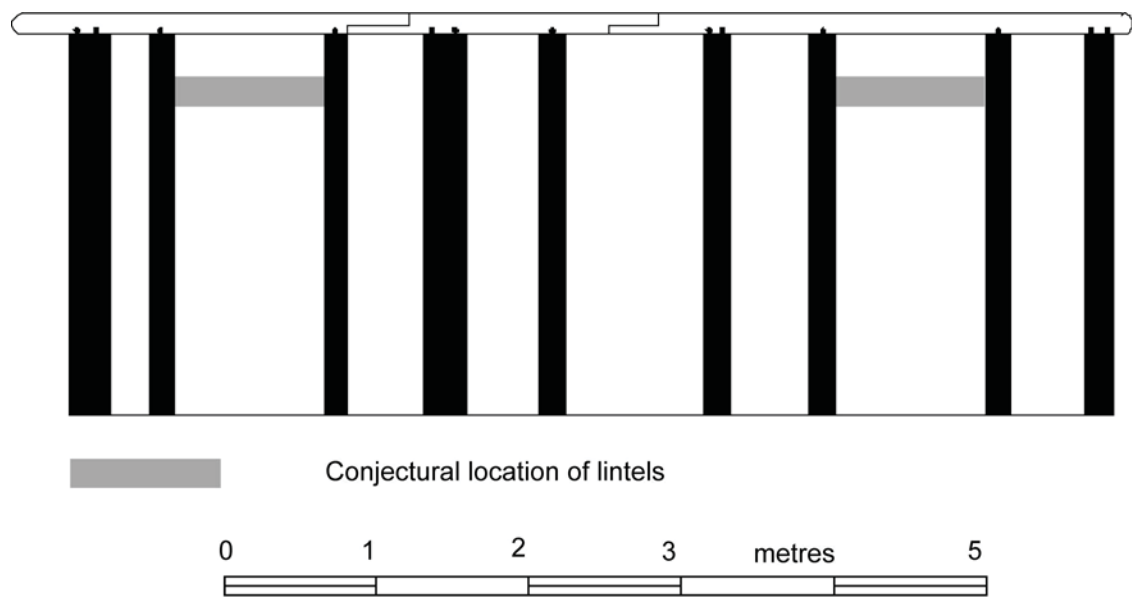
Reconstruction of the wall based on the mortices (*scale 1:50*)
